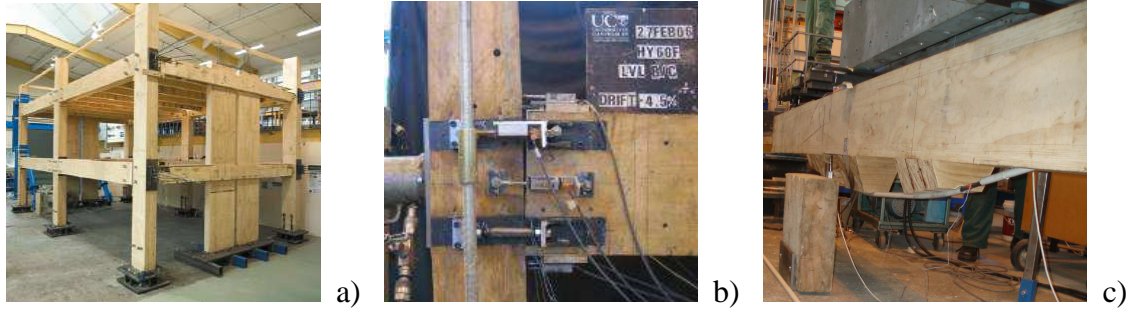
Unbonded post-tensioned timber frames and beams: a) Pres-Lam timber building tested for earthquake loads [9]; b) Rocking connection; c) Post-tensioned timber beam tested for vertical serviceability loads [11]
